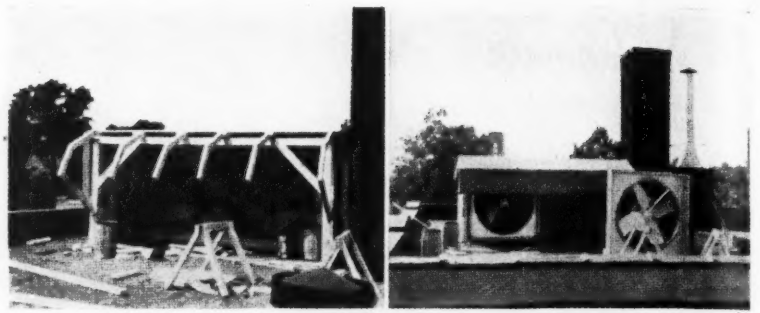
(left)—A hooded penthouse for twin fans in construction. See Fig. 8 also. Fig. 7 (right)—Further details of construction for a twin fan penthouse. (Both photos by Hunter Fan & Ventilating Co.)
